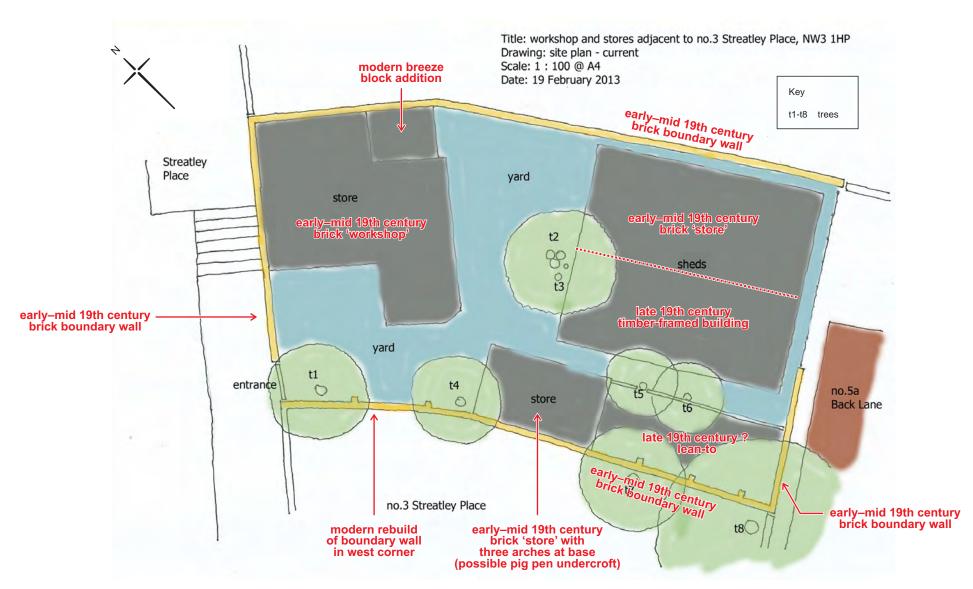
Plan of the existing site showing the mid-to-late 19th century structures
